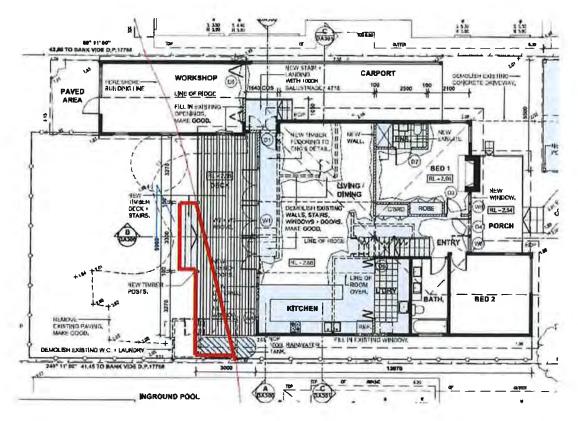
Plan extract showing area of proposed deck and roof over encroaching into the foreshore area.
